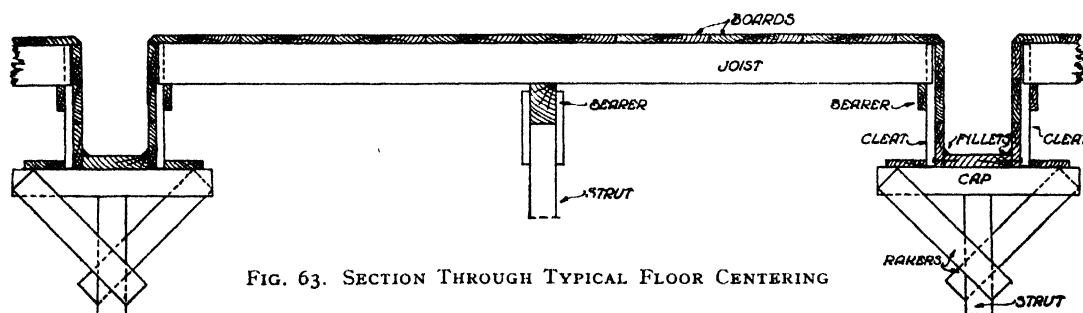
SECTION THROUGH TYPICAL FLOOR CENTERING
